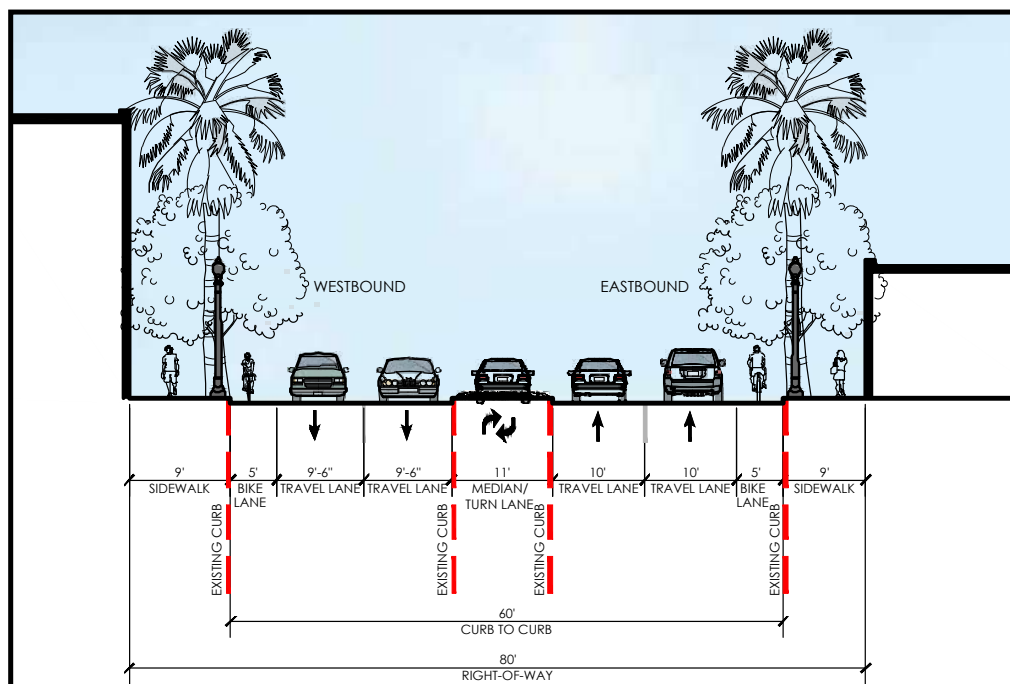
, Carlsbad Village Drive: Existing Conditions Section
